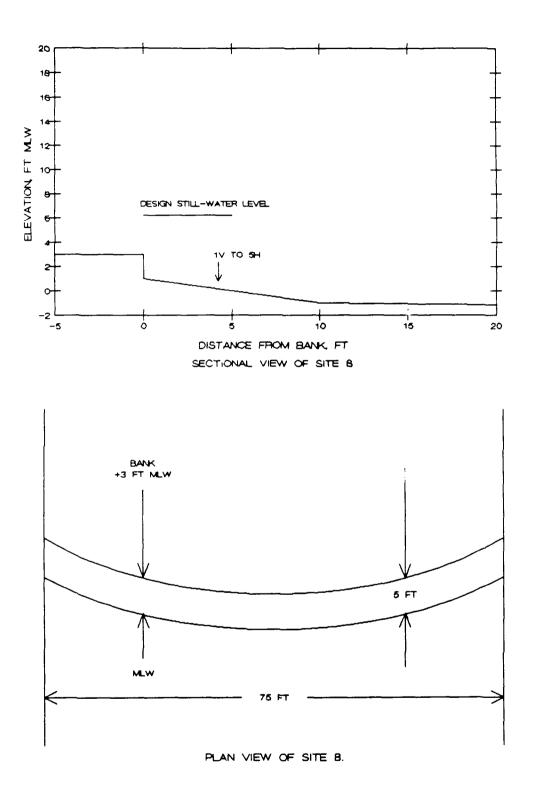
SECTIONAL AND PLAN VIEWS OF SITE 8
